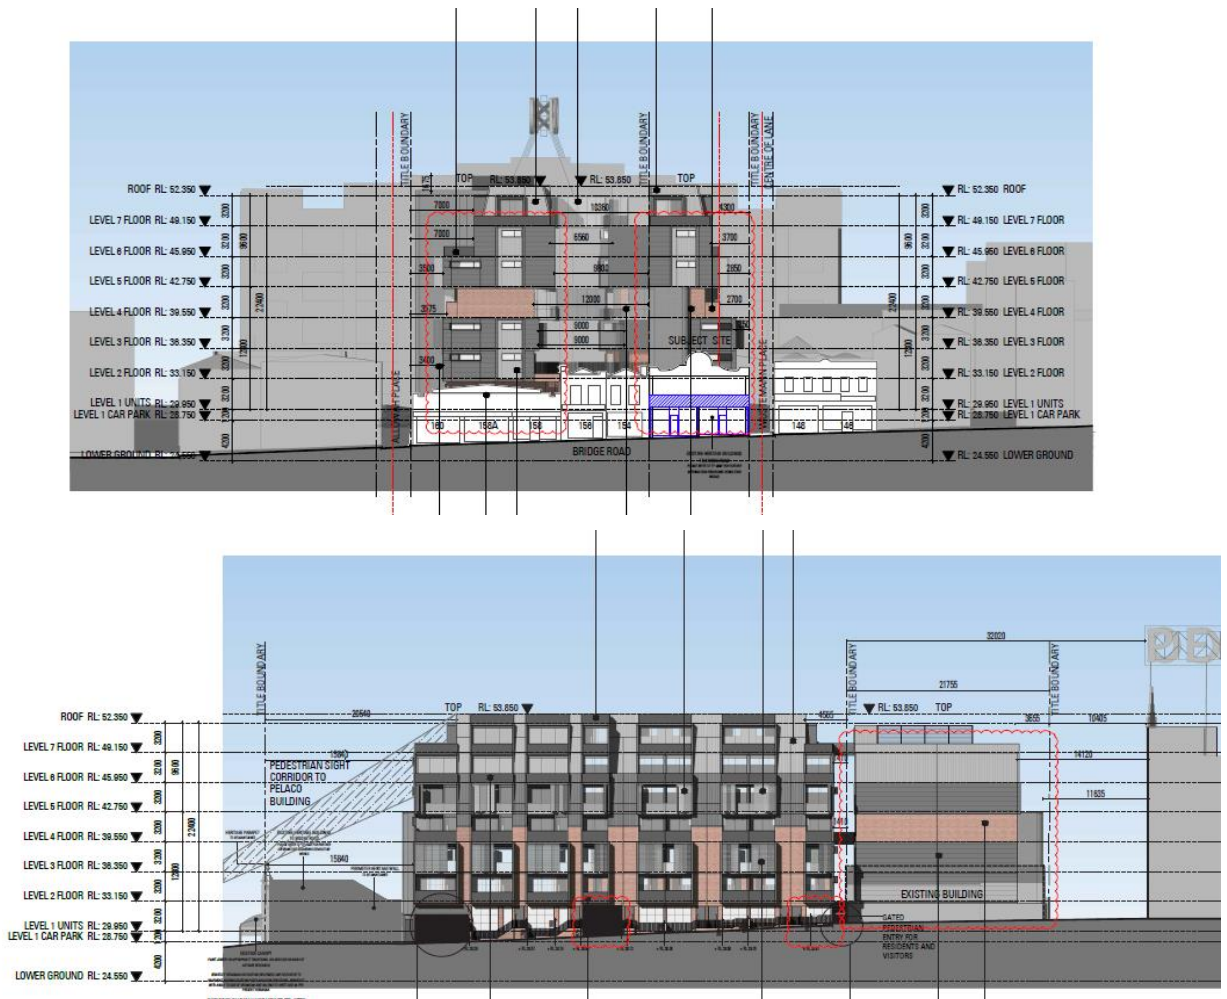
Front (north) and Western Elevations to Application PLN17/0131
